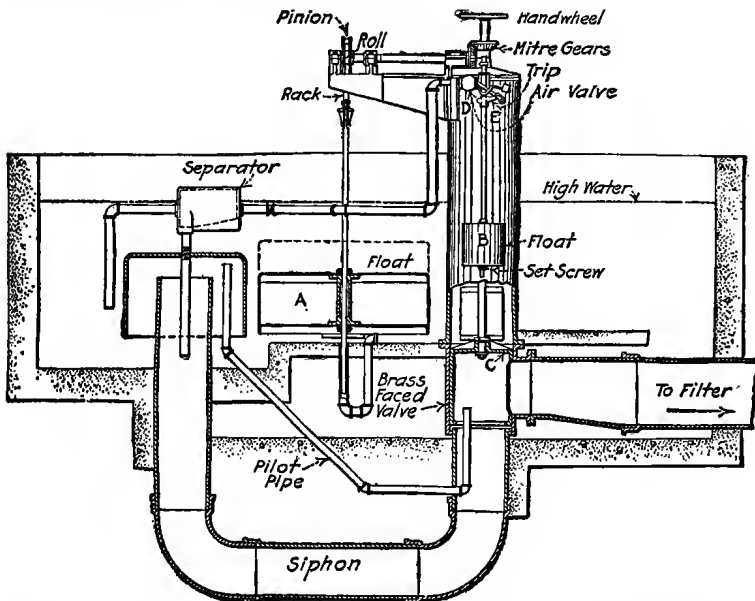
Sectional elevation of Barbour dosing apparatus at North Attleborough, Mass.
